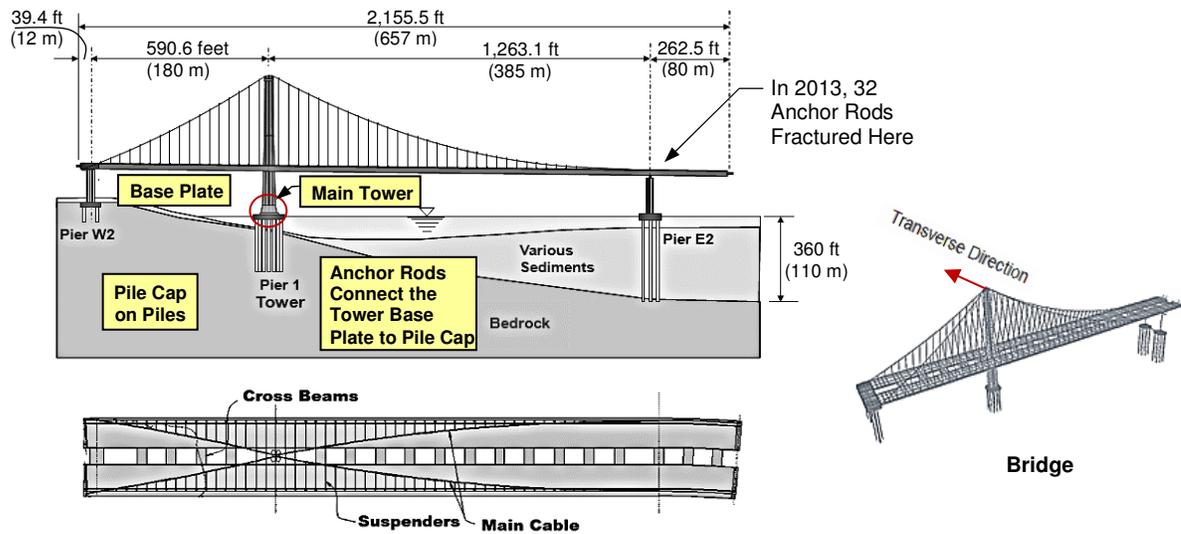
Elevation and Plan View of the SAS Bay Bridge
